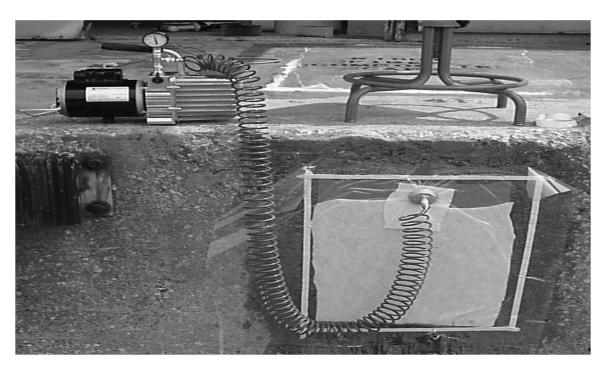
Vacuum Pump and Attachments on a Trial Sample
